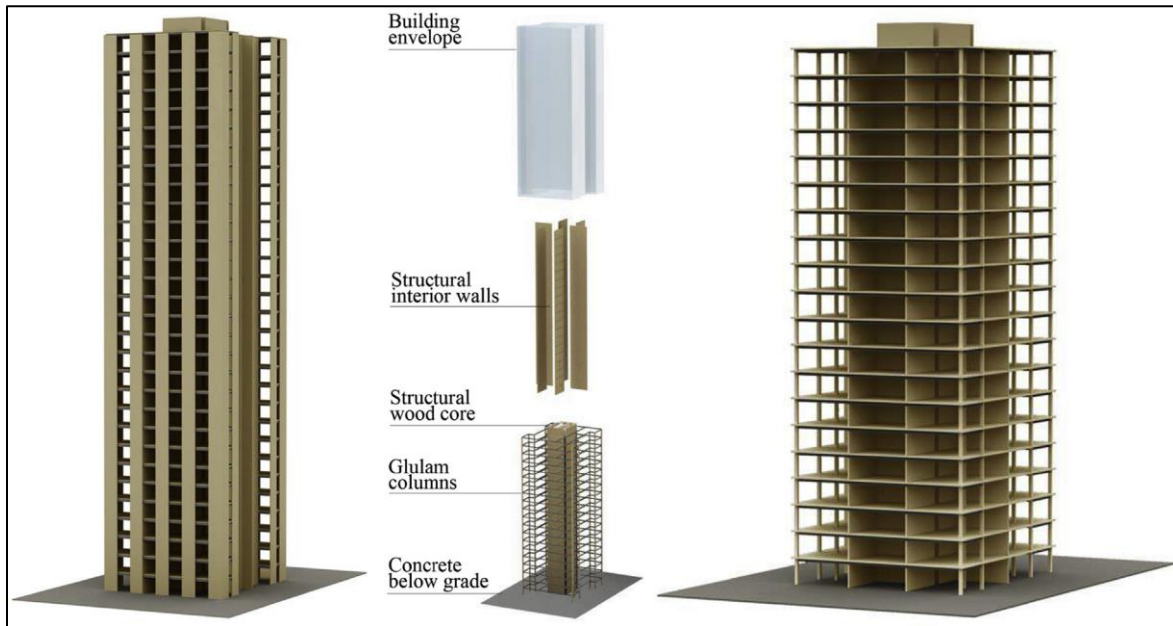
Tall Building Structures (Source: Asdrubali et al., 2017)
